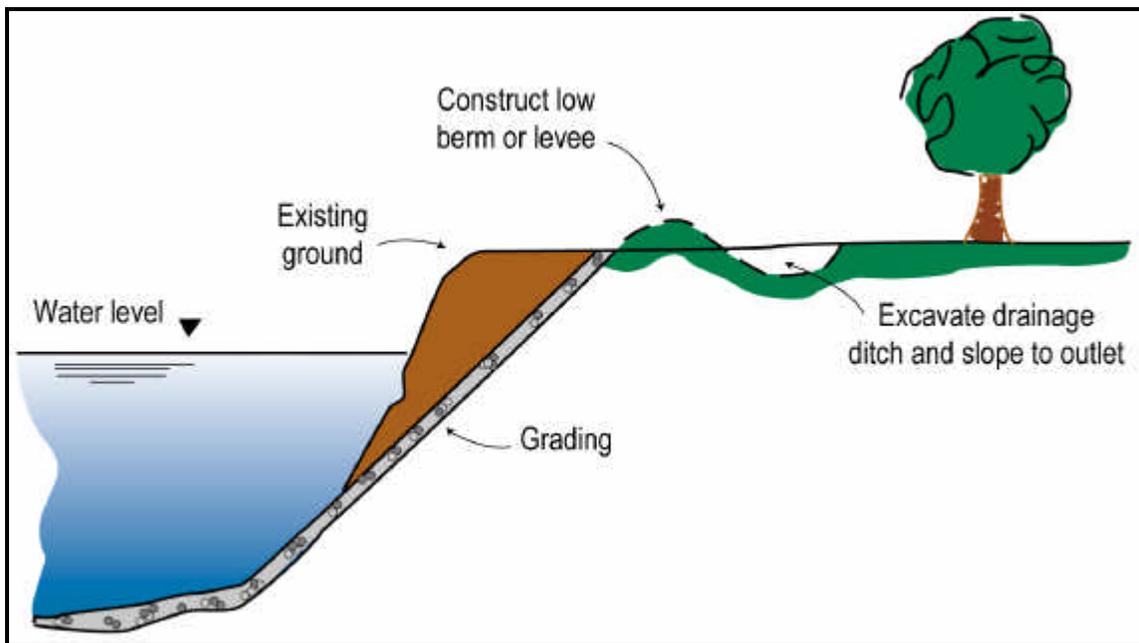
Construction of Berm or Levee to Control Overbank Drainage
